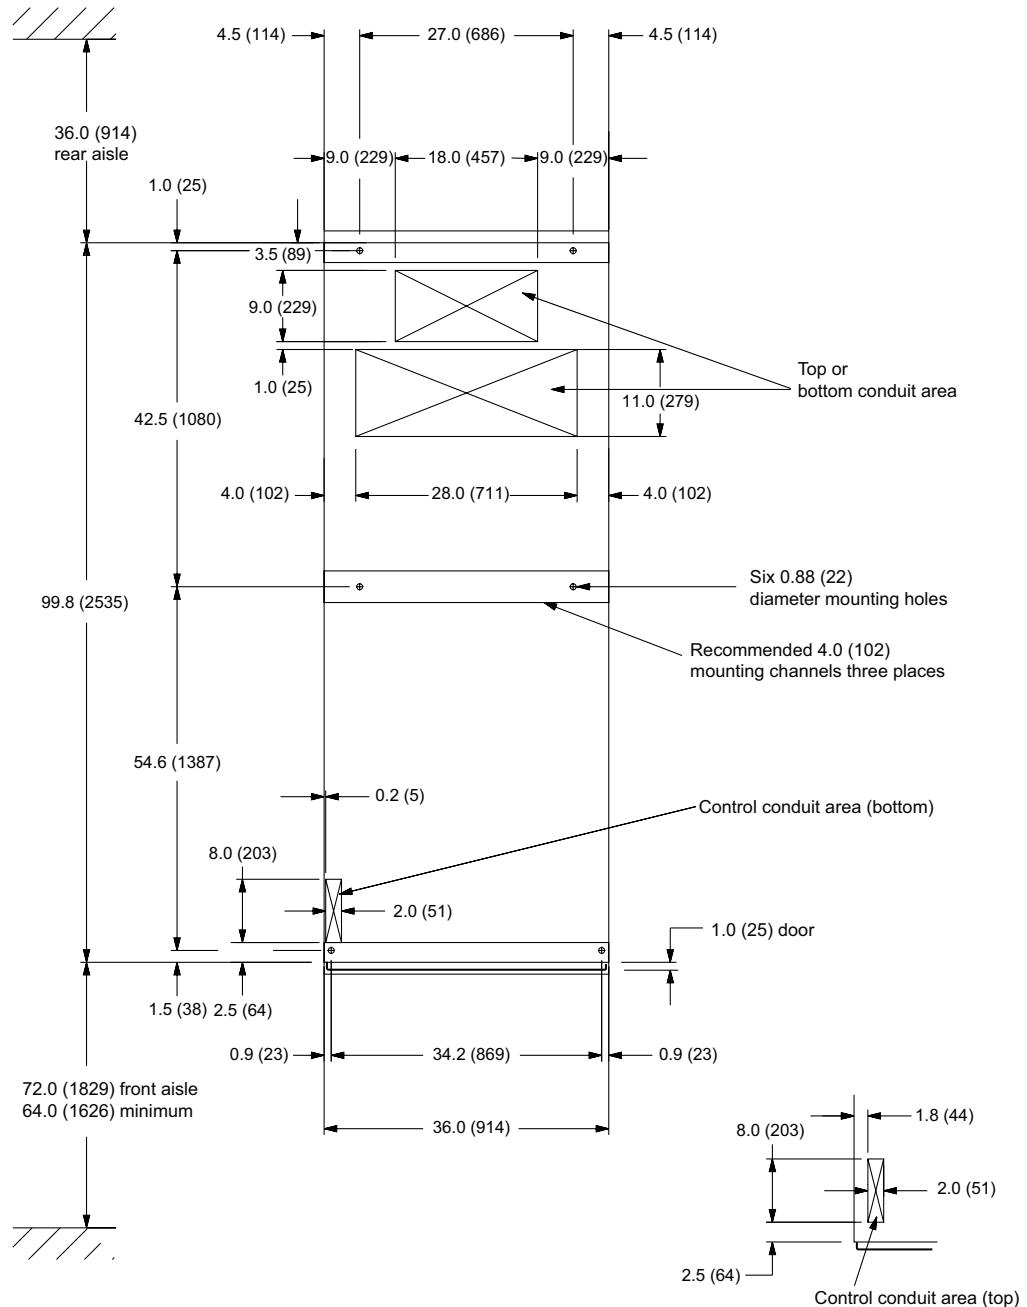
Masterclad Extended Floor Plan for 63 kA-Rated Switchgear
